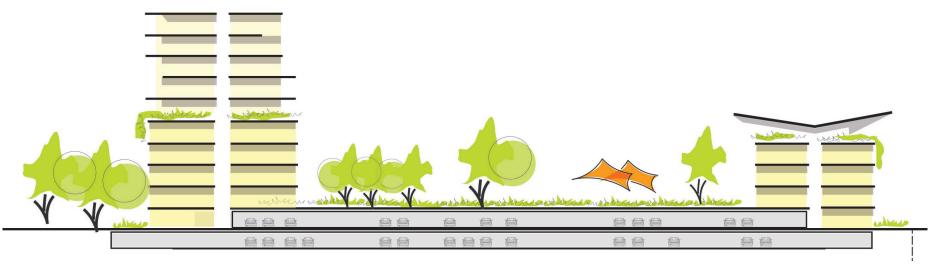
67 Integrated MSP and underground parking strategy section diagram
